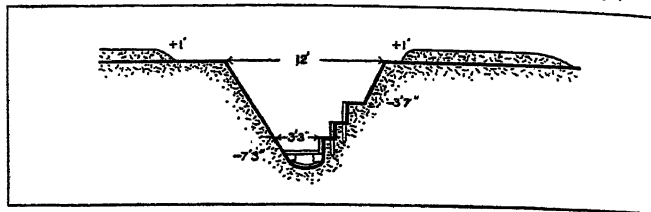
TRENCH WITH WOODEN REVETTING SPACED 3 FT. APART
